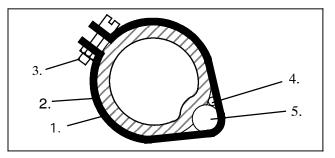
Thermostatic Expansion Valve Bulb and Thermocouple
